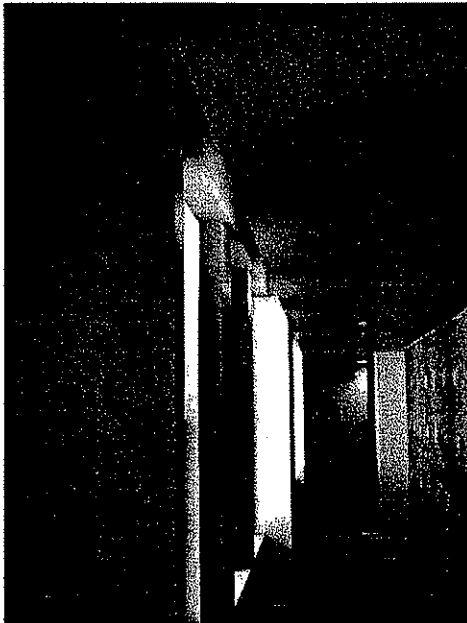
Interior of corridors across rear light well, all stories, 2 – 12. The ceiling was finished to conceal the HVAC ductwork and all related mechanical venting and electrical conduit to create a more finished look. Note that the ceiling detail was crafted to keep the ceiling from cutting off the height of the windows, and the finished wall surface is 16" from the window, per NPS specifications.
